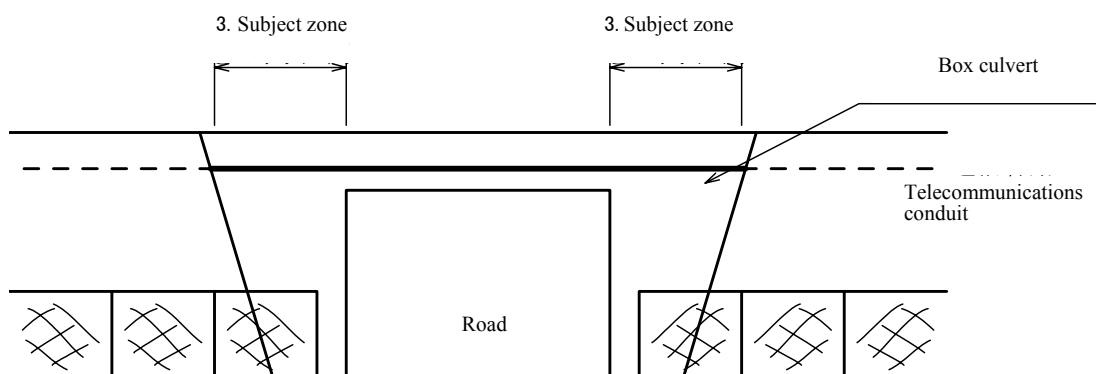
Box culvert where slope with grass could be exposed to spreading fire
